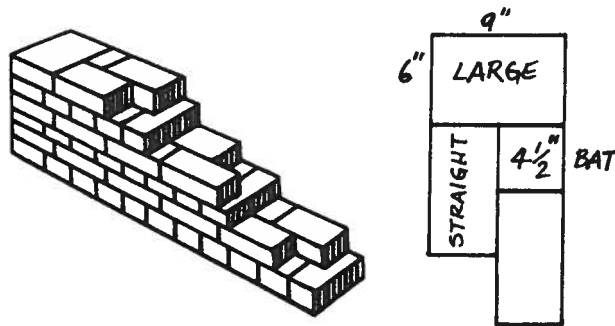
6: Layout for base of 9" alternate header and stretcher wall.
